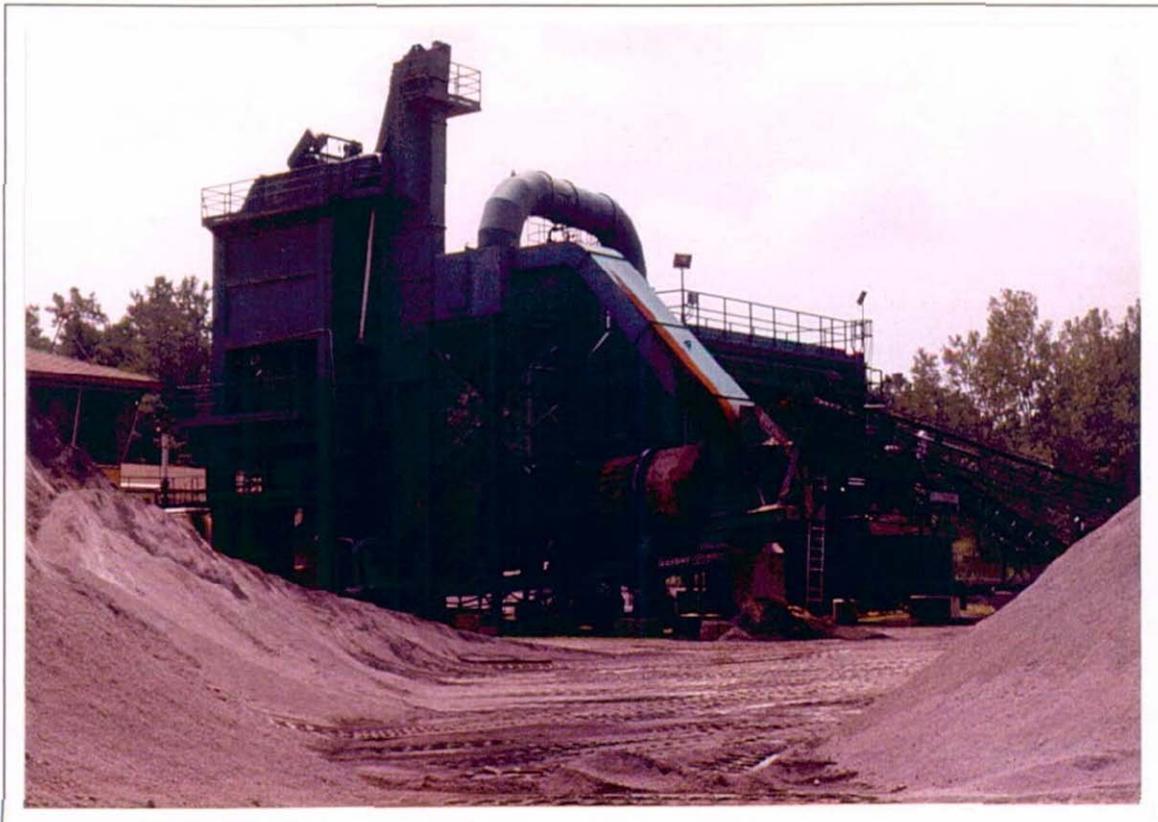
Trap Rock Industries' Sta-Seal's Barber Greene batch asphalt plant at Florence, NJ
